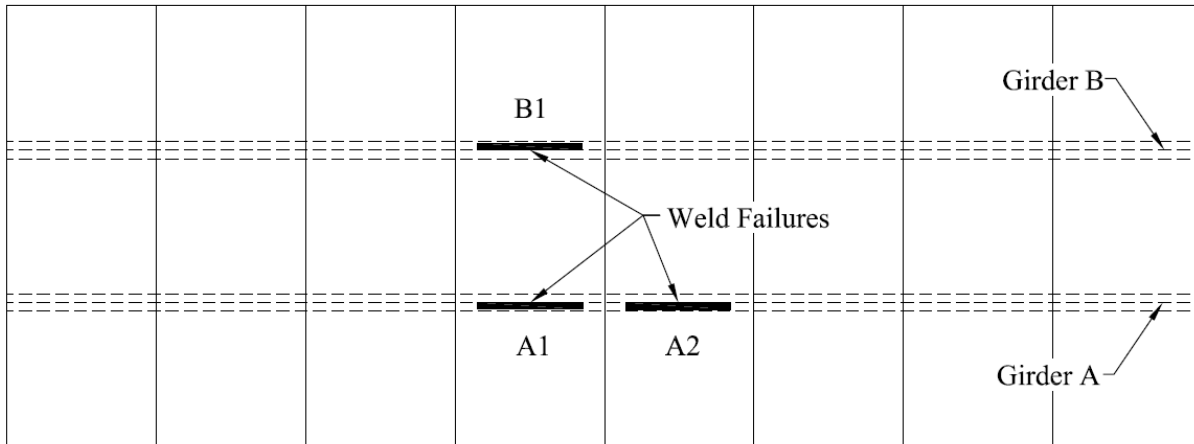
Location of the weld cracks at 43,000 cycles
